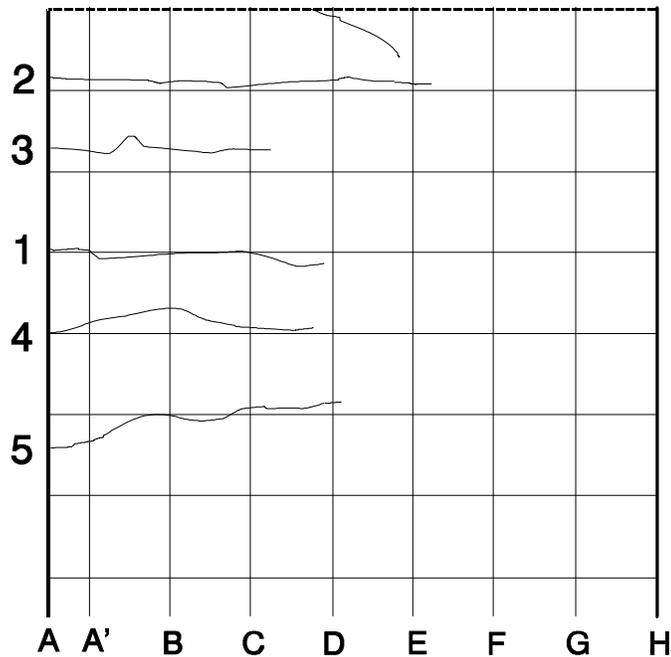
POJ-RC-100-TH cracking pattern on north face of pier at service load
